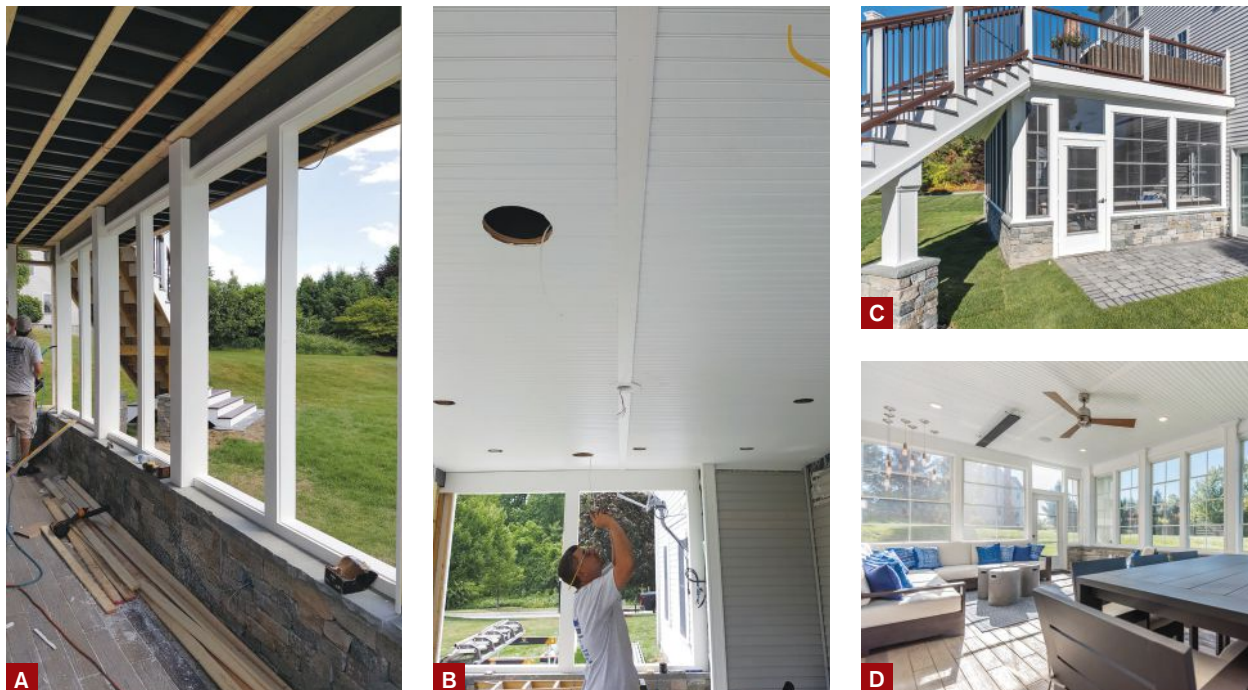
Under the deck, the crew poured a concrete slab floor, built CMU knee walls finished with stone veneer, and framed the window openings (A). PVC was used to prep the openings for the prefabricated aluminum screen windows and to finish the ceiling (B). A small paver patio links the new three-season porch with the walkout basement (C), while the concrete slab floor within the enclosed porch was tiled with porcelain pavers with the look of a wood floor (D).
